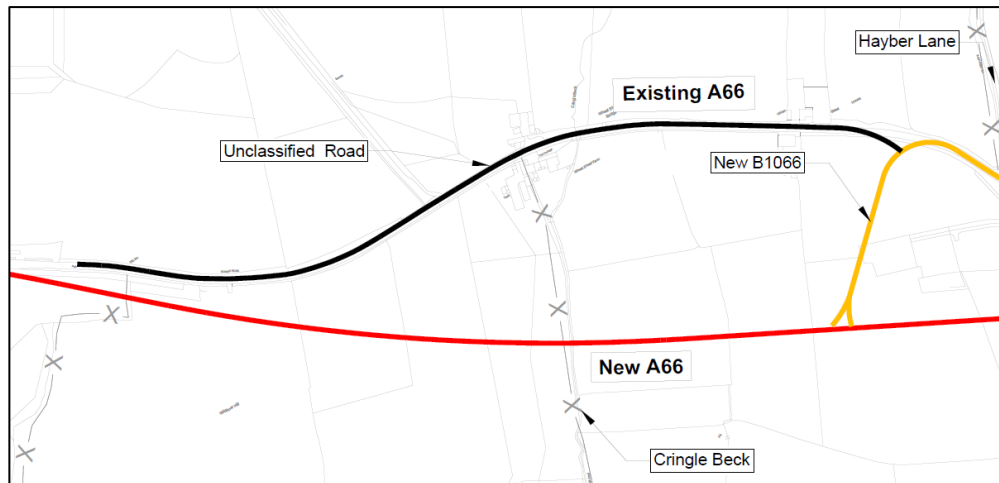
(c) Extract from Classification of Roads Plans (After)
